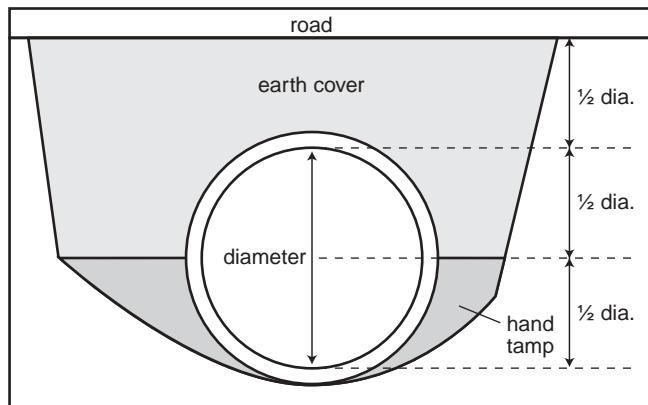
Cross-Sectional View of a Closed Culvert.
